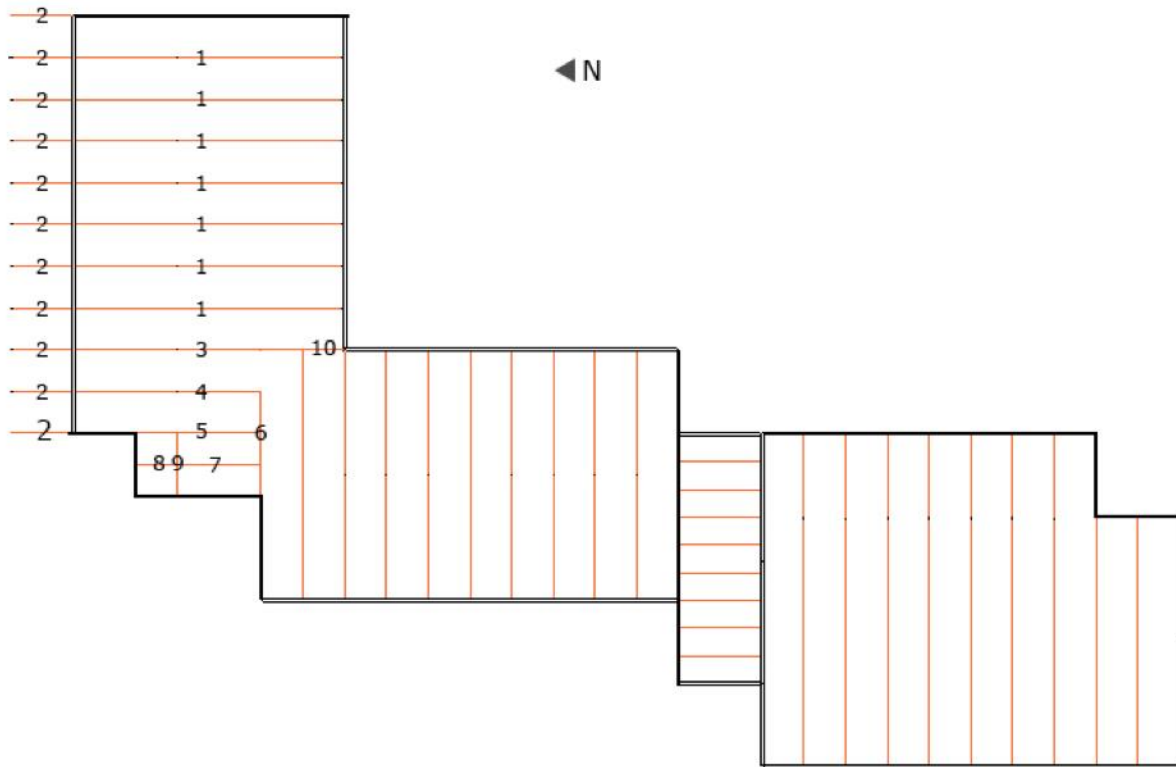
Roof Framing of the Expansion with Beams and Trusses Labeled
